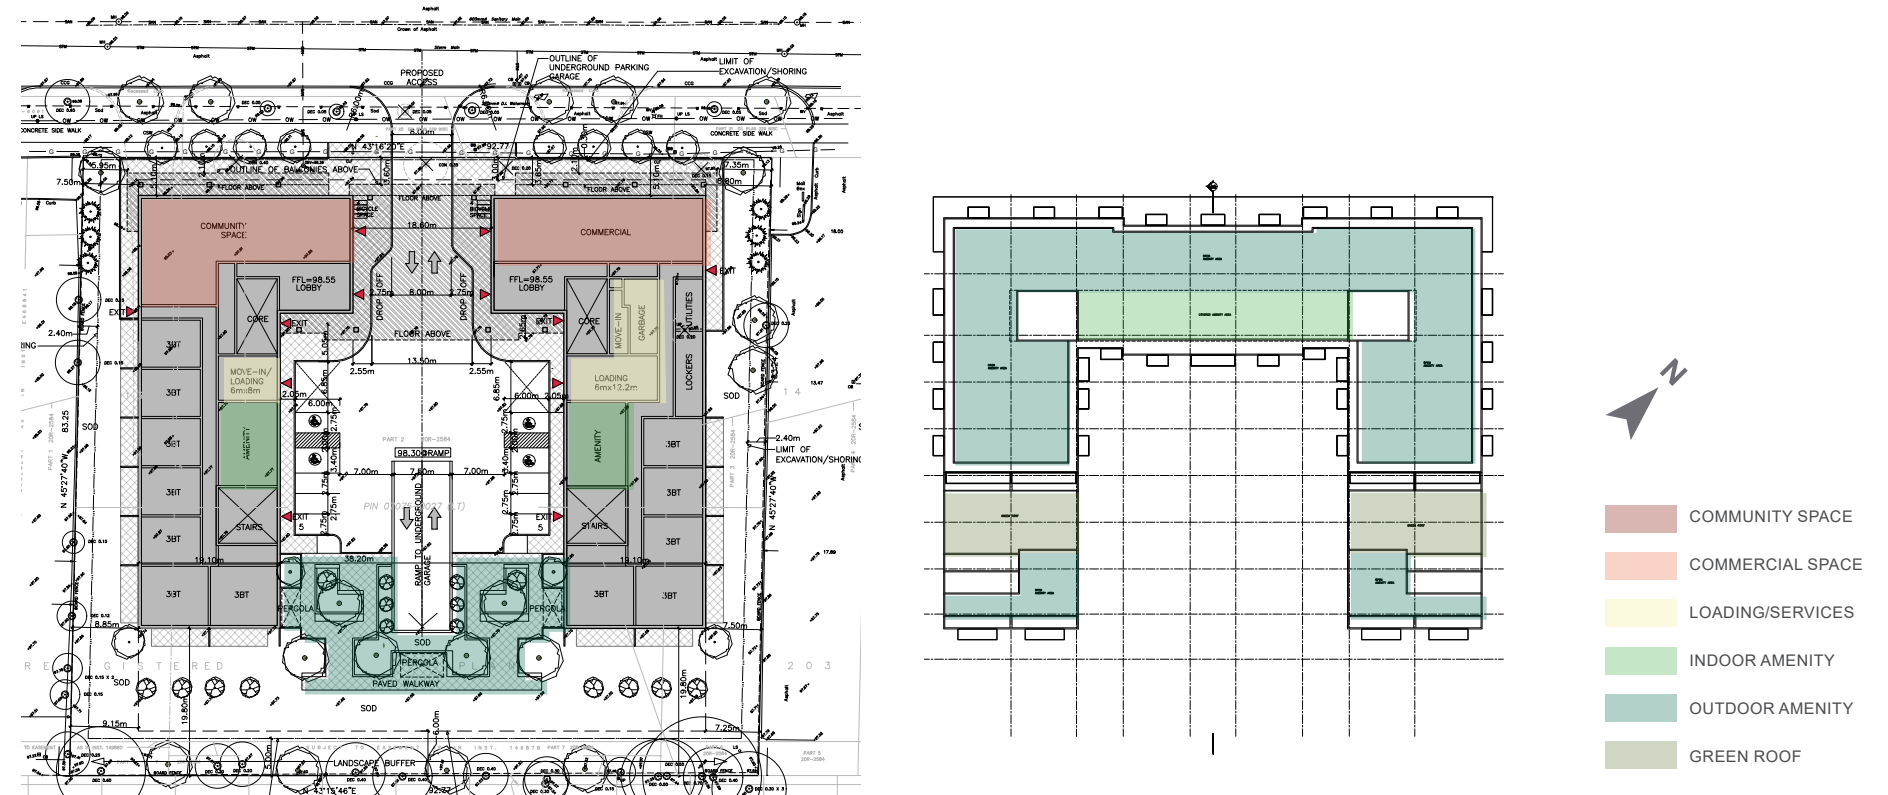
Site plan (left) and Roof Plan (right) with Illustration of Servicing, Loading and Amenity Areas
